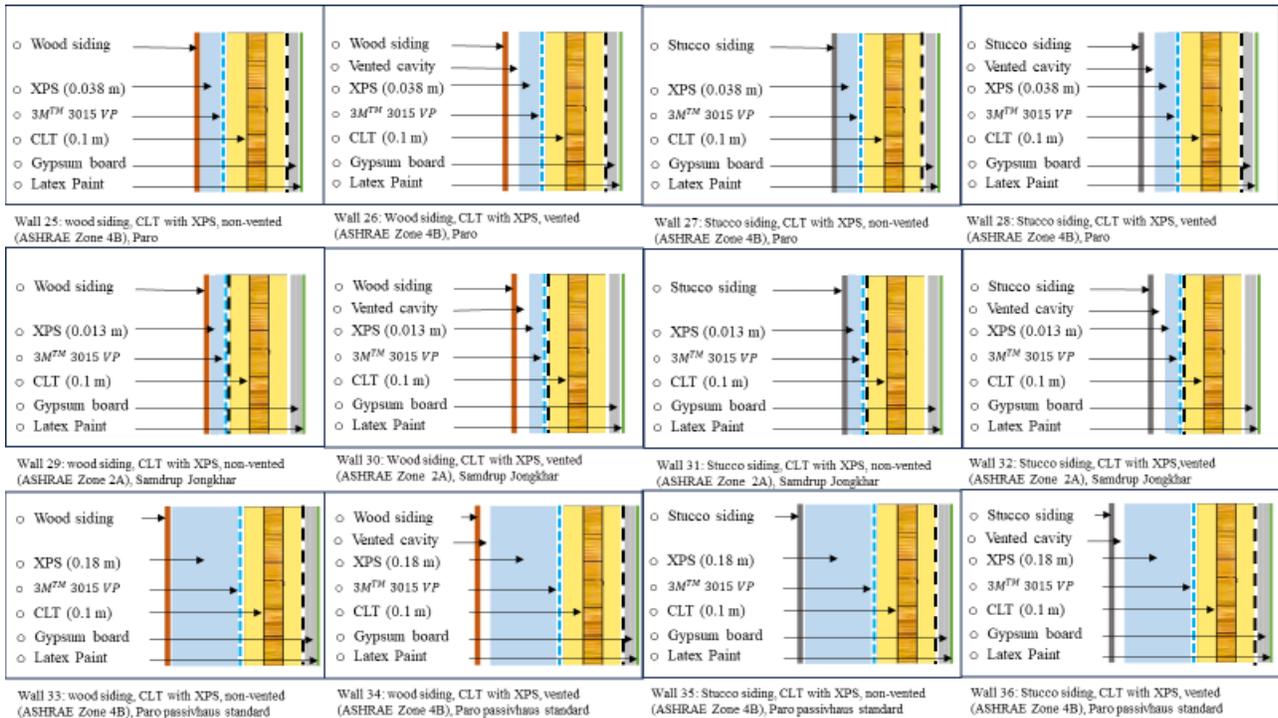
CLT configuration wall (25-36) with XPS insulation, with Vapor barrier
